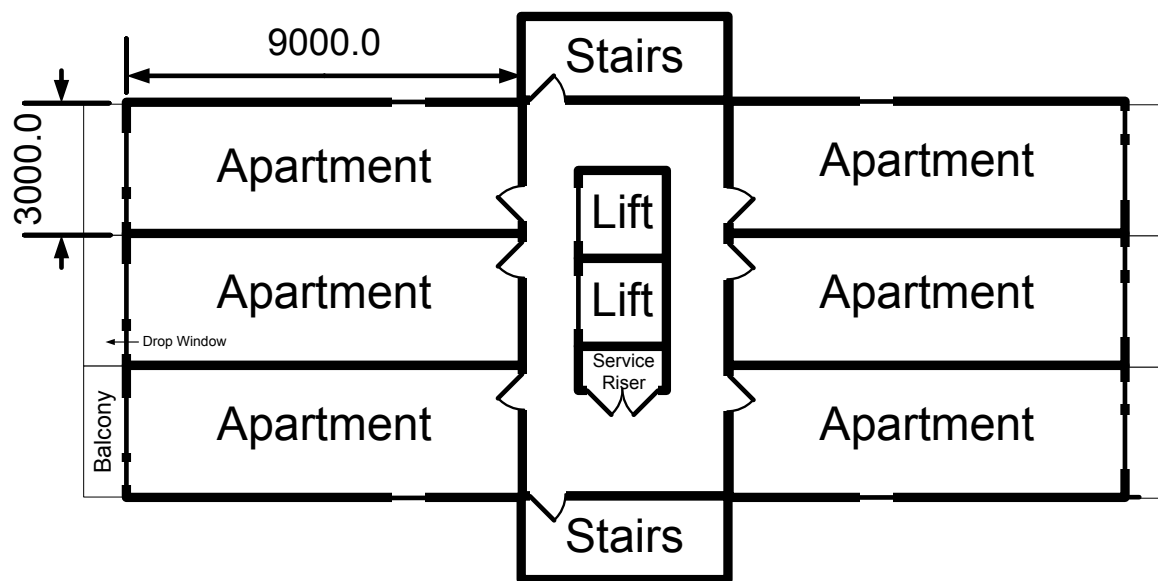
Typical level plan view of scenario 1 compliant building.
